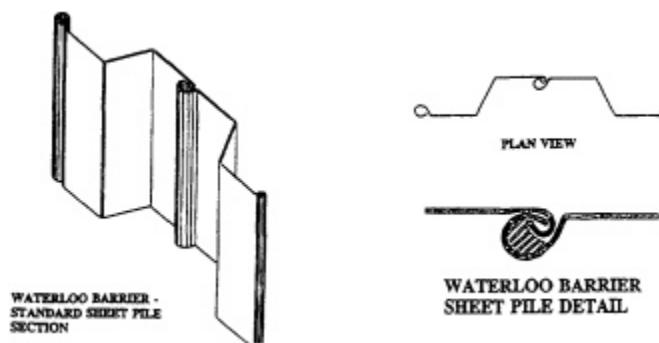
The Waterloo Barrier™ system, showing interlocking steelsheet piling and modified joint with the sealable cavity.
